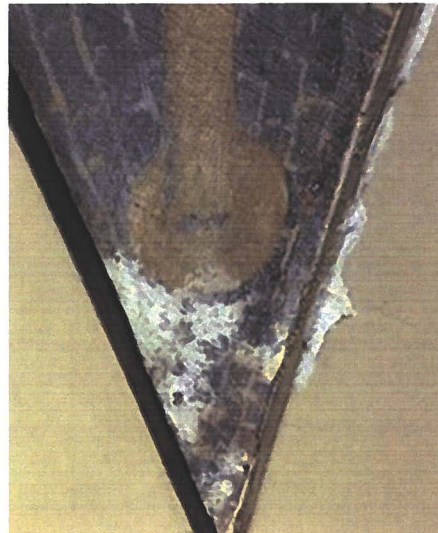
Detail of water damage and efflorescence at mural and adjacent plaster molding. (Photo by EverGreene, August 2020)
